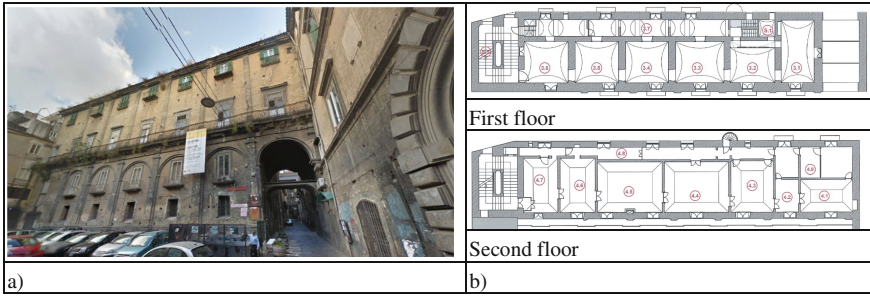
The building before the rehabilitation: a) View from the East side; b) Some floor plans
